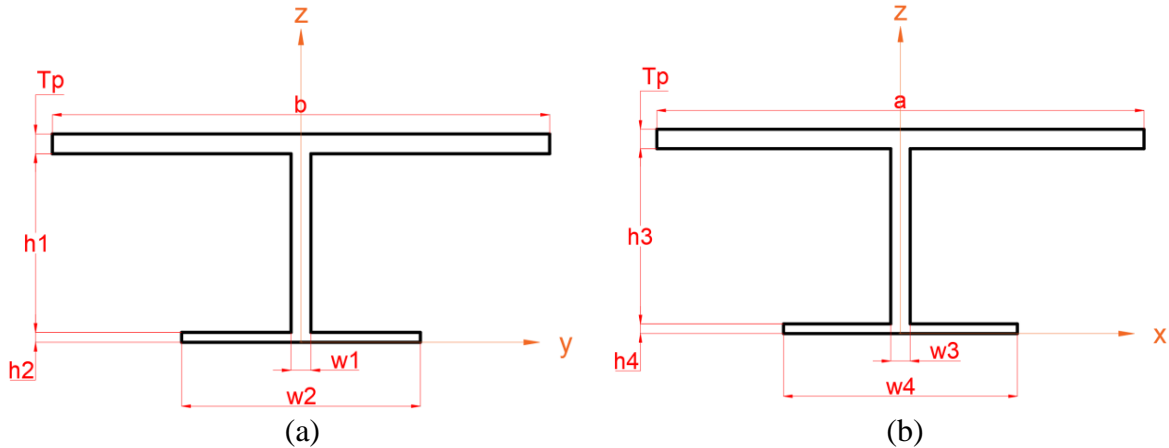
Cross-section of the structure elements (a) Cross-section of the stiffener; (b) Cross-section of the girder (Note: drawing not to scale).
